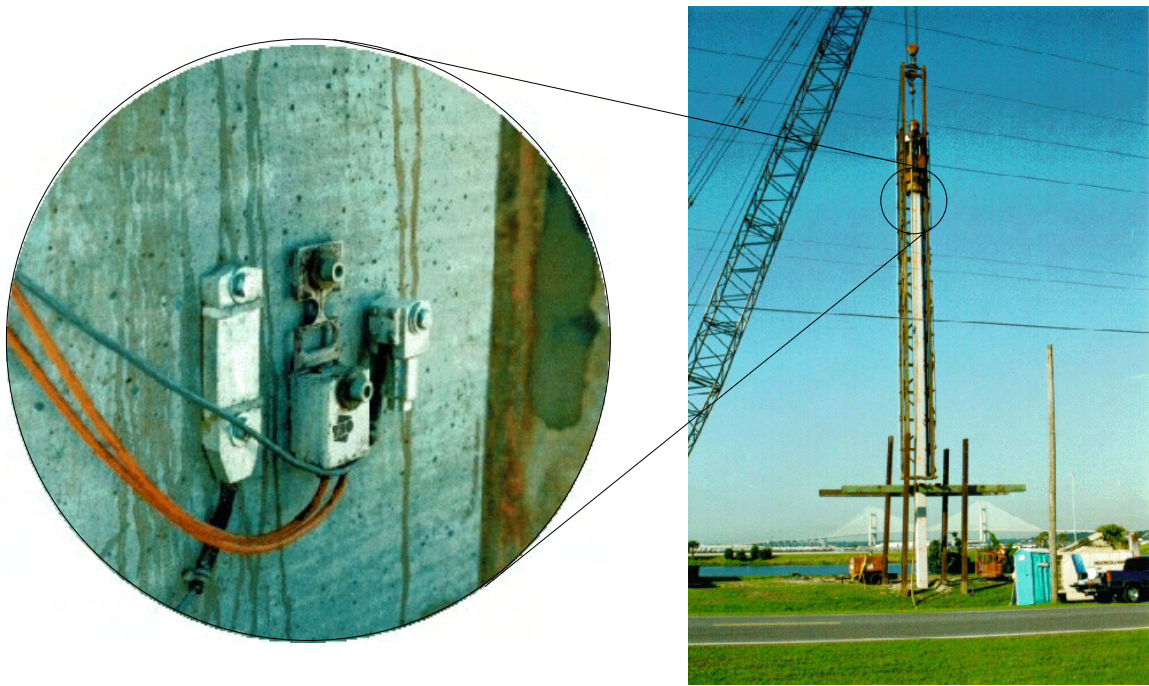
Equipment used for sonic echo test (left), impact hammer struck on shaft head (right).
